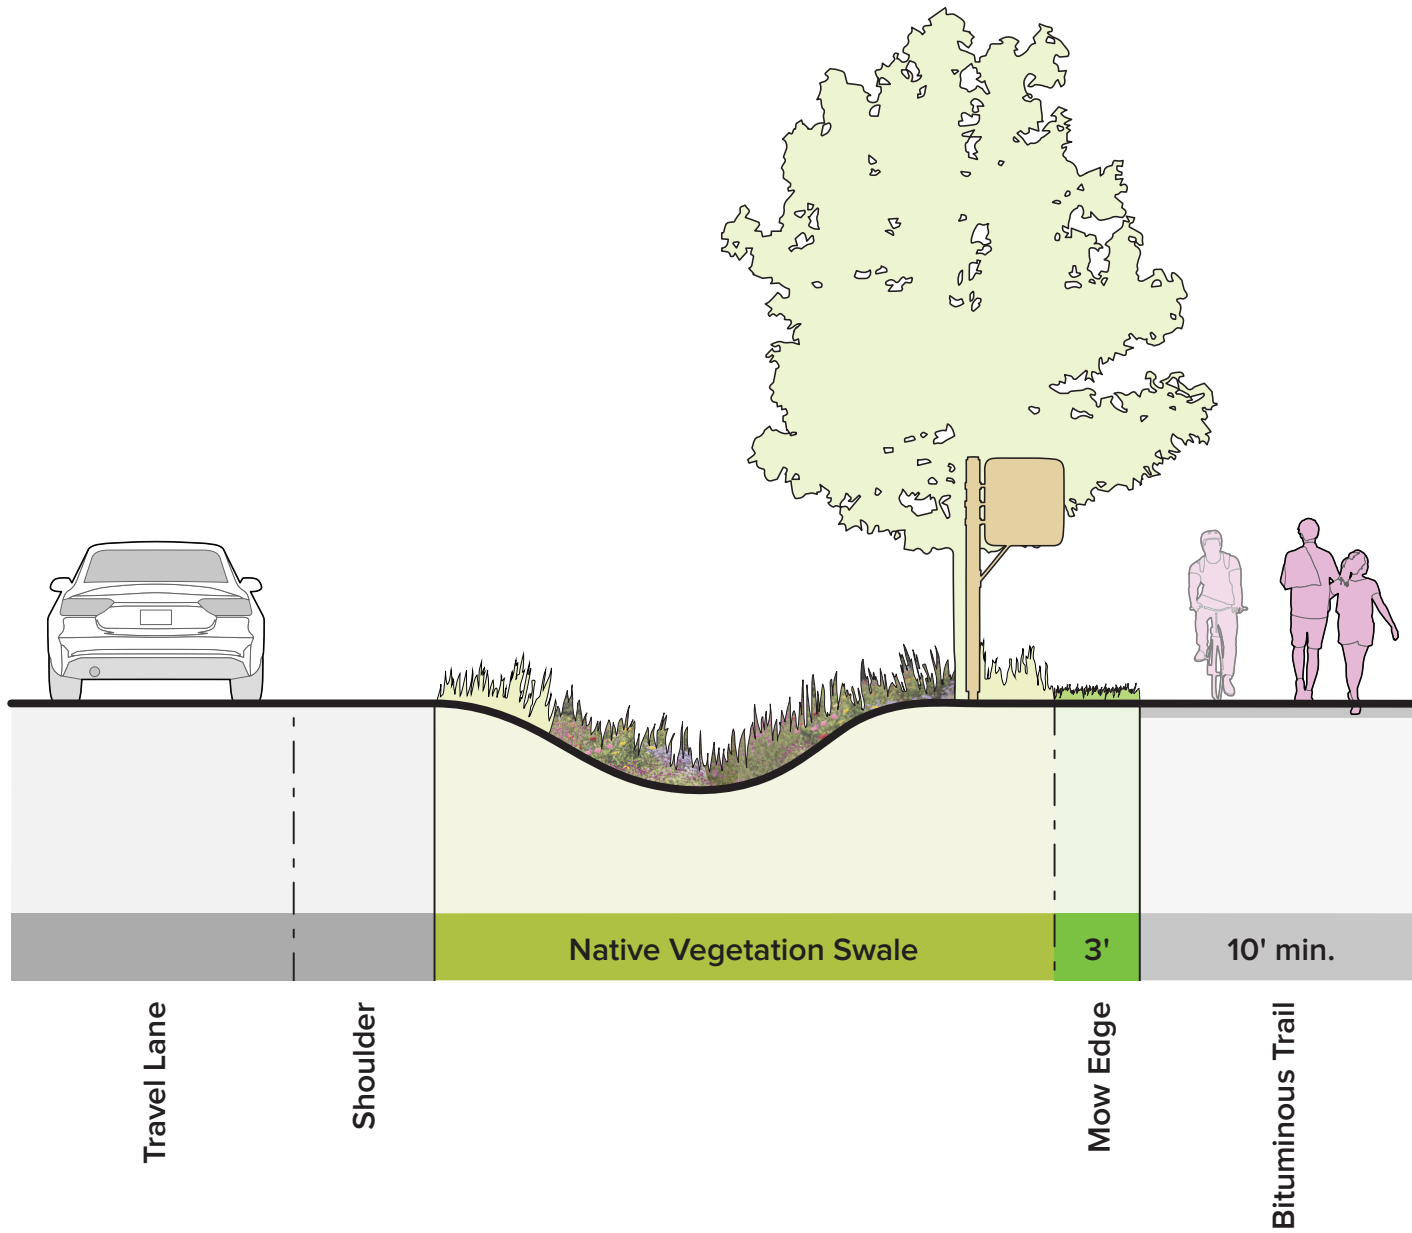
RURAL CROSS-SECTION ALONG ROAD
